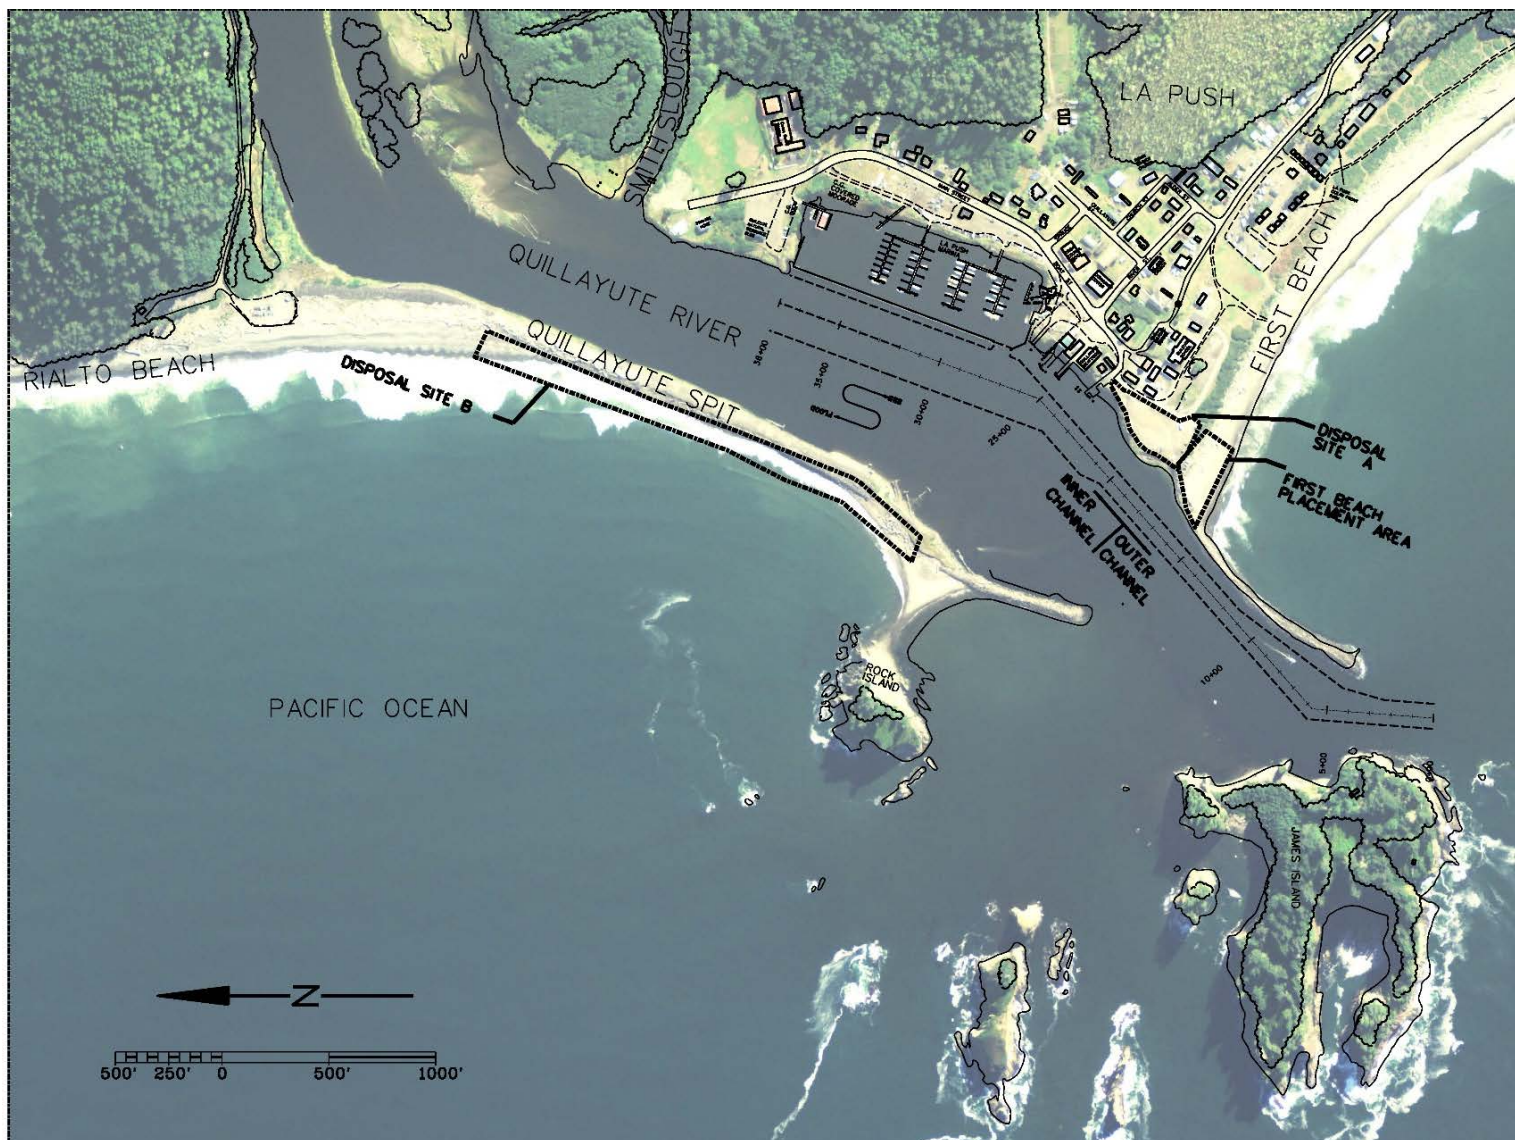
Quillayute River Federal Navigation Channel and boat basin with Disposal Site A, Disposal Site B, and First Beach sediment placement area.
